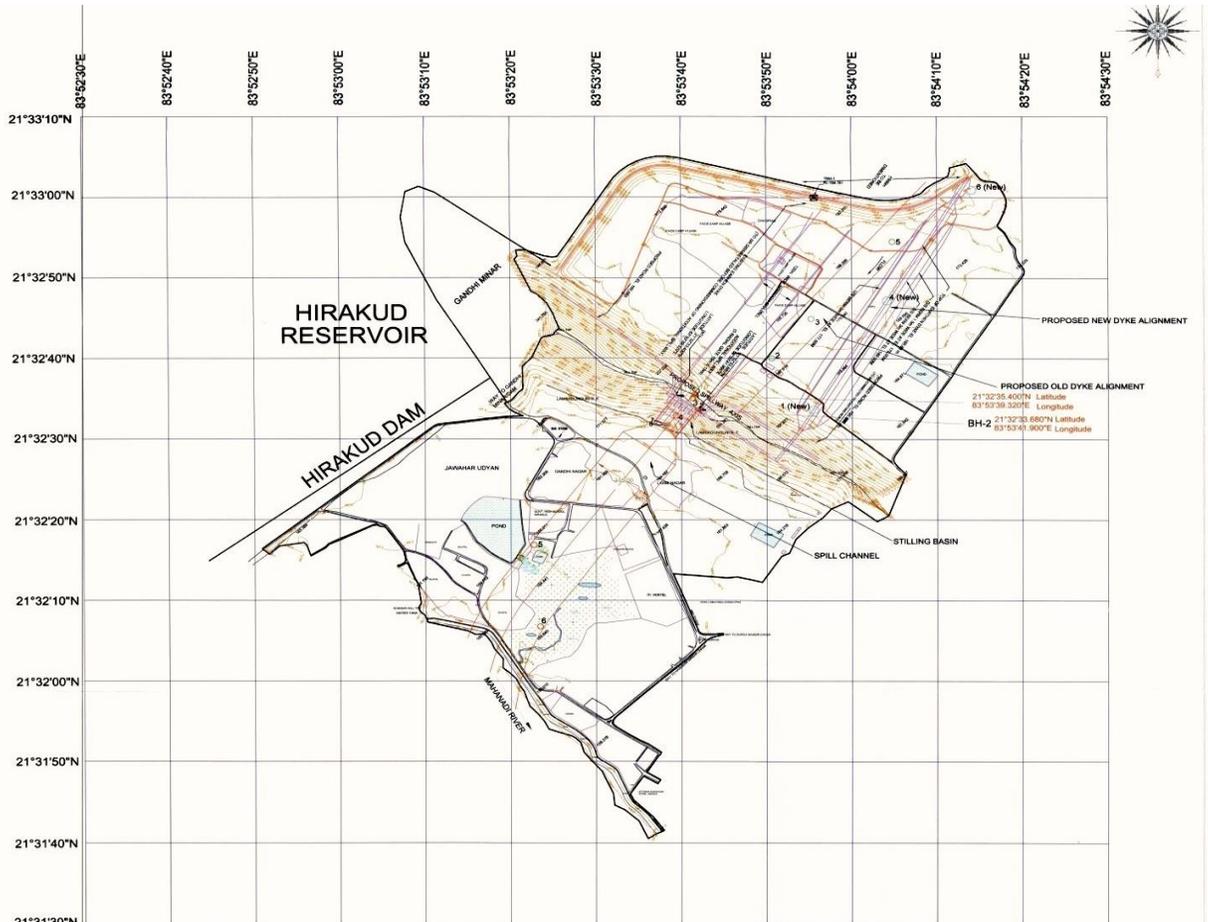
General layout plan of the proposed additional spillway site, Hirakud Dam Project, Sambalpur, Odisha.
